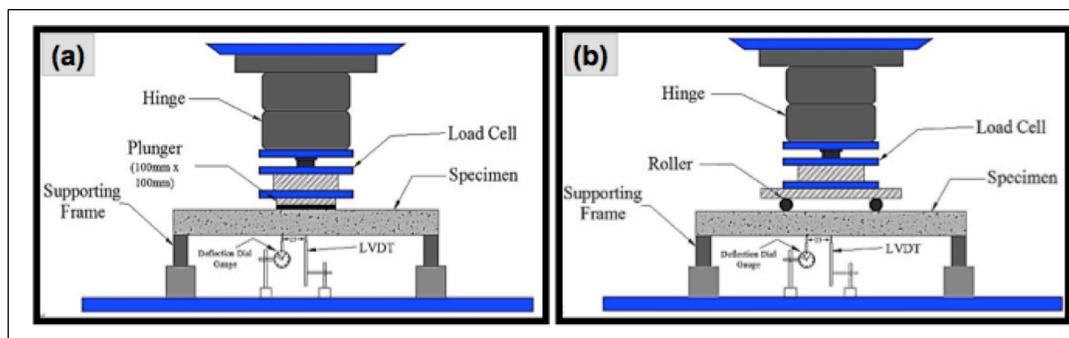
Schematic diagram for test setup; (a) Punching shear test (b) Bending shear test
